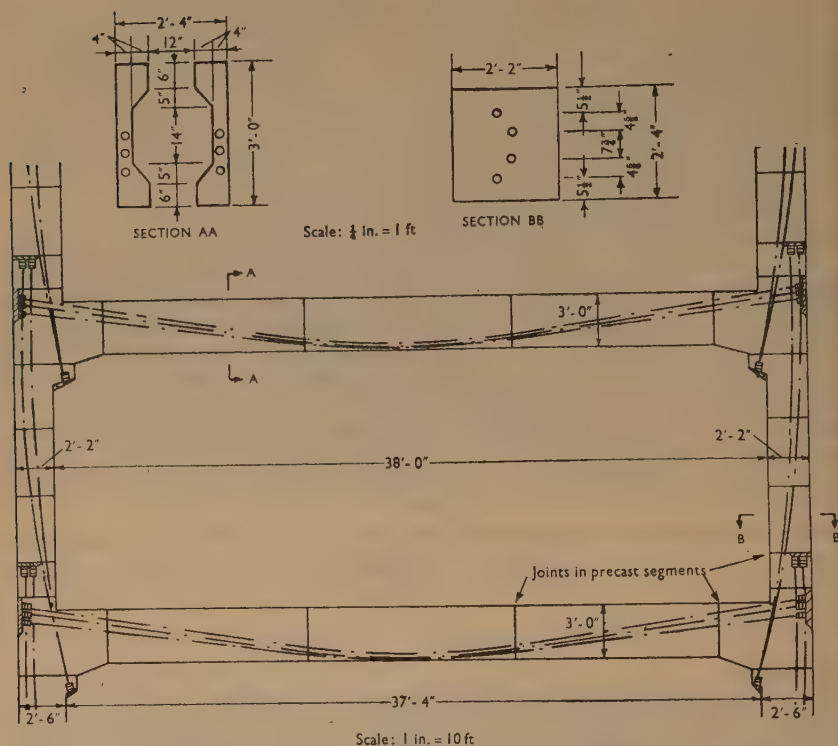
SINGLE-STOREY MULTI-BAY CONSTRUCTION FOR GALERIES LAFAYETTE, PARIS
